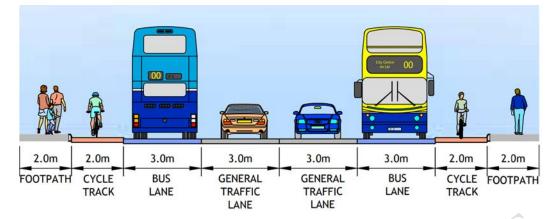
Cross Section A-A (Relevant to PC5, PC6, PC7, PC8, PC9 & PC10)
